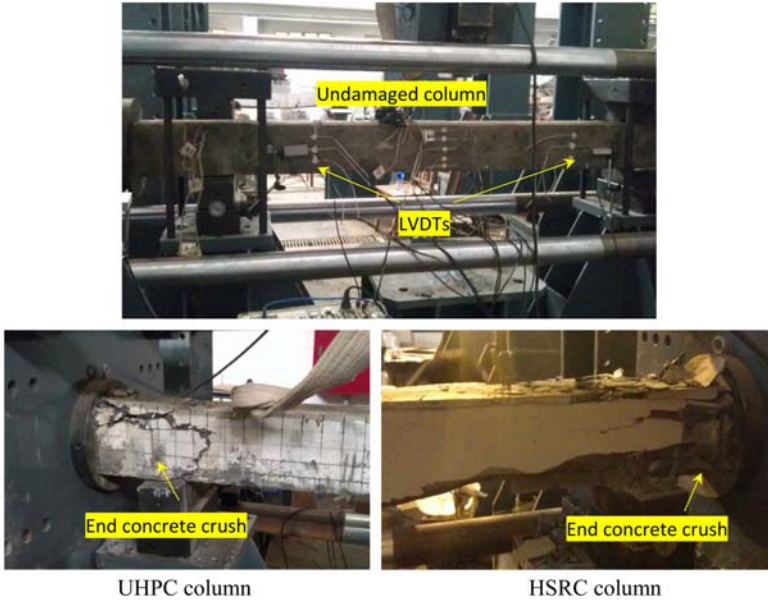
Concrete crush near the supports of the undamaged UHPC column and HSRC column.
